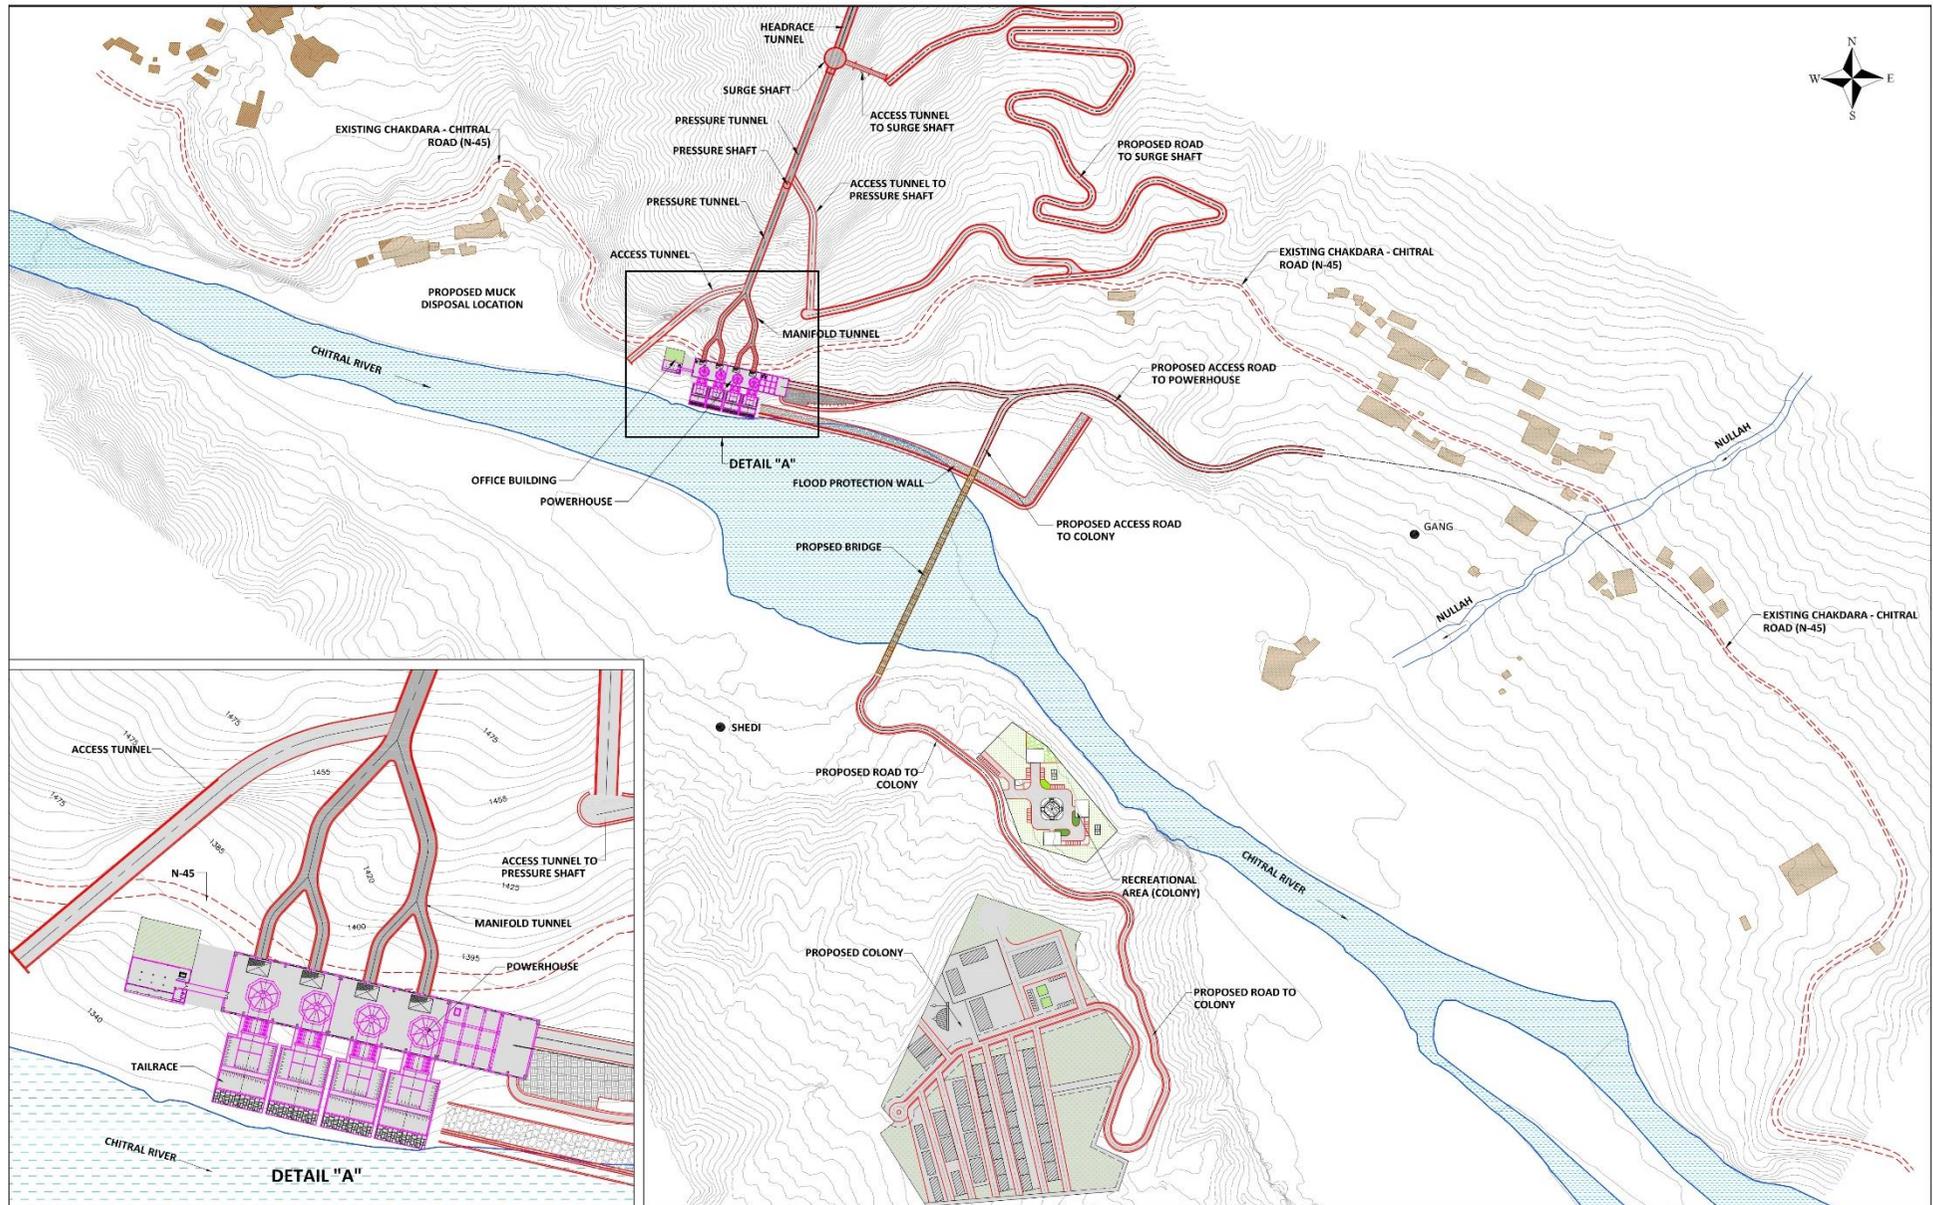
Layout Plan Powerhouse and Appurtenant Structures
